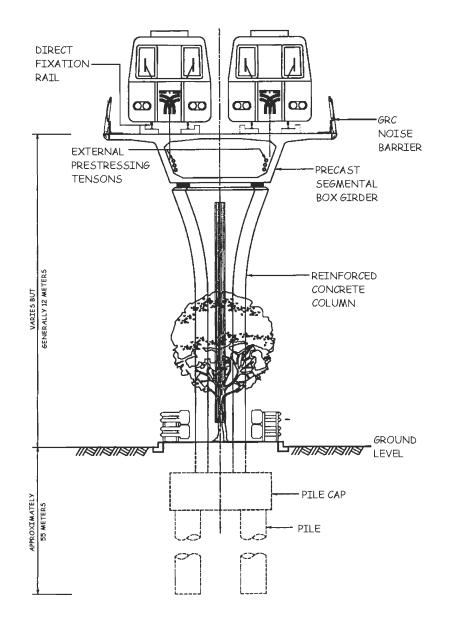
TYPICAL COLUMN AND VIADUCT
